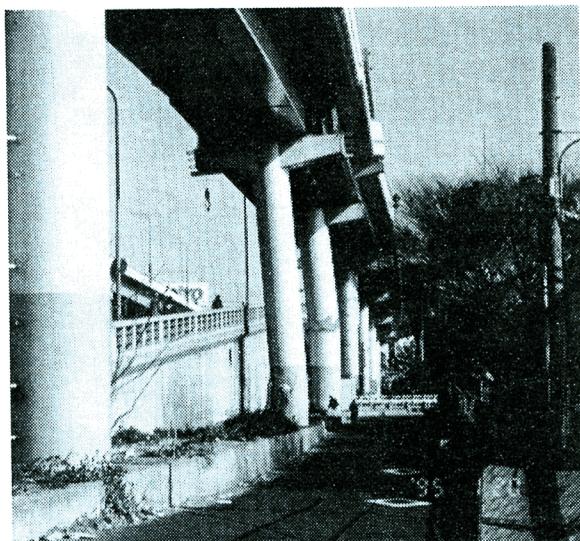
Bending failure of single column type highway viaduct metal piers
